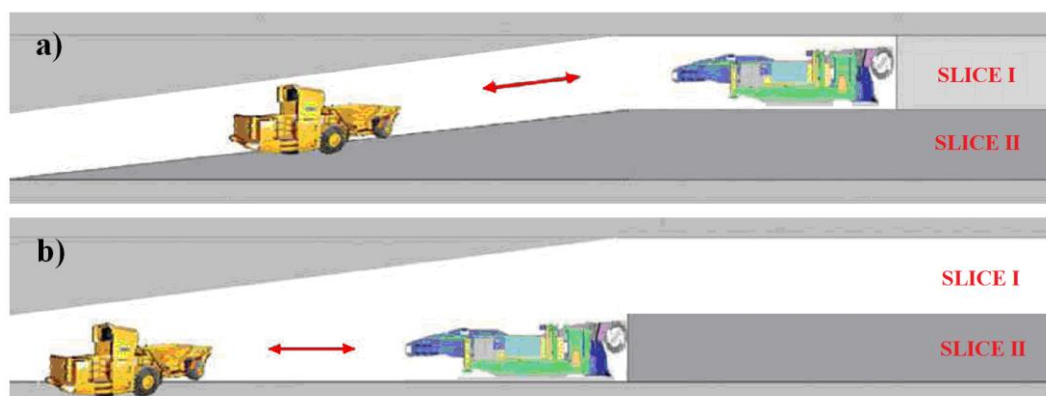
Mining rooms in slices – longitudinal section: a) Extracting the first slice; b) extracting the second slice; (adapted by Sandvik)
